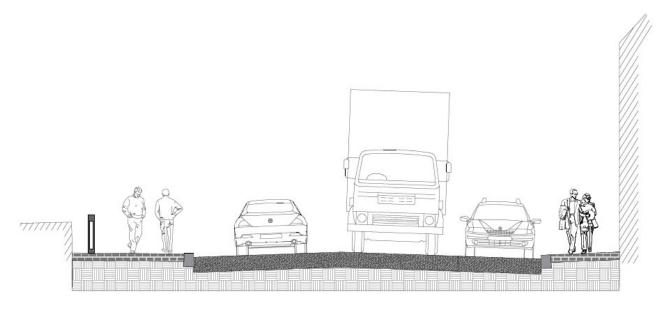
Typical Proposed Cross Section - N51 Main Street East (Section at Ch. 70)
